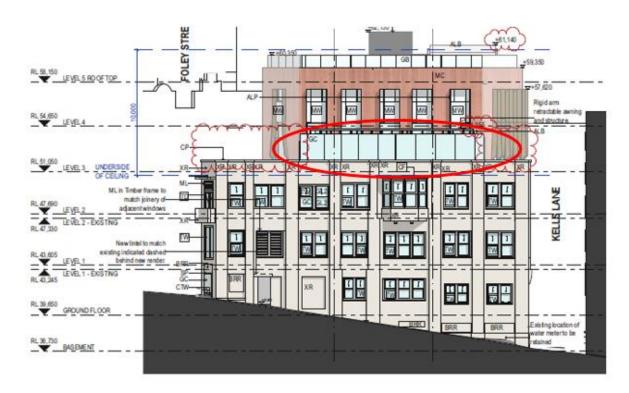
Proposed Langley Street elevation showing bulk of level 3 terrace and associated noise attenuation structures
